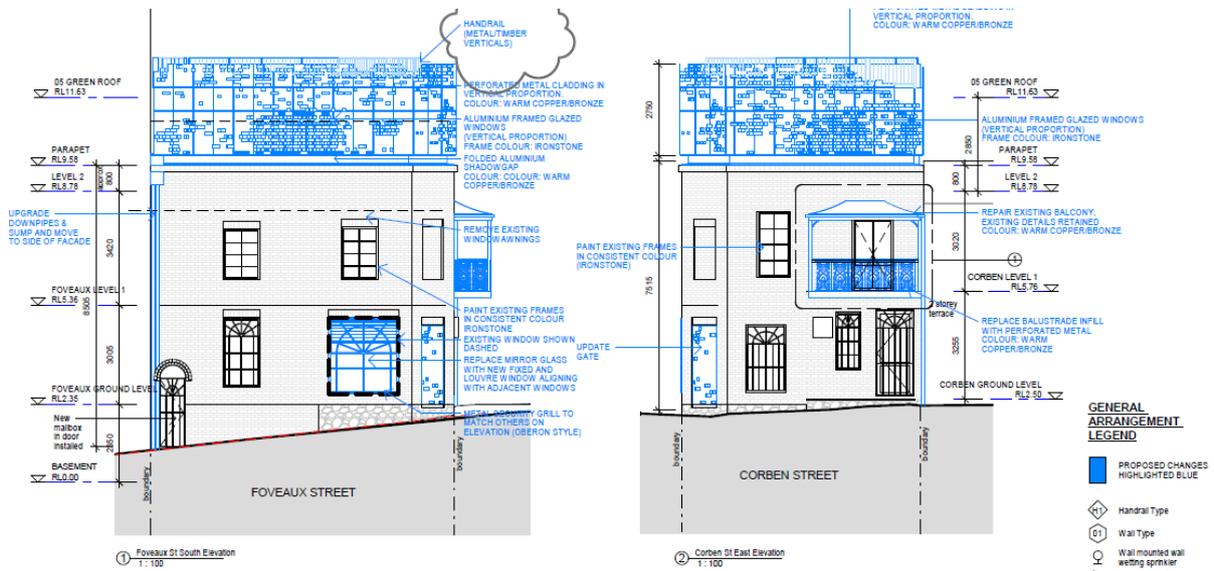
Proposed elevations to Foveaux Street and Corben Street
